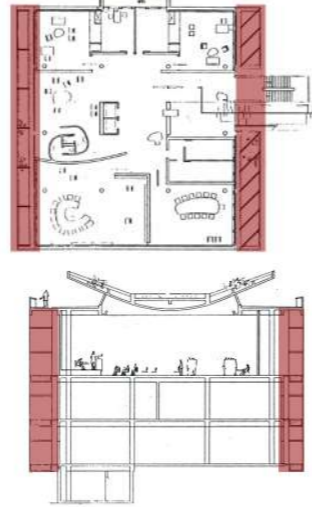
Above: Mill Owners' Floor Plan and section, showing briese-soleil porous/enclosing elements (Author 2018).
